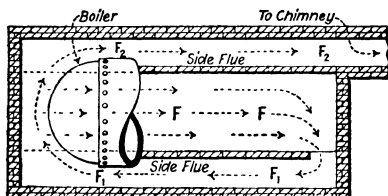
Wheel-draft circuit of the egg-end boiler.
